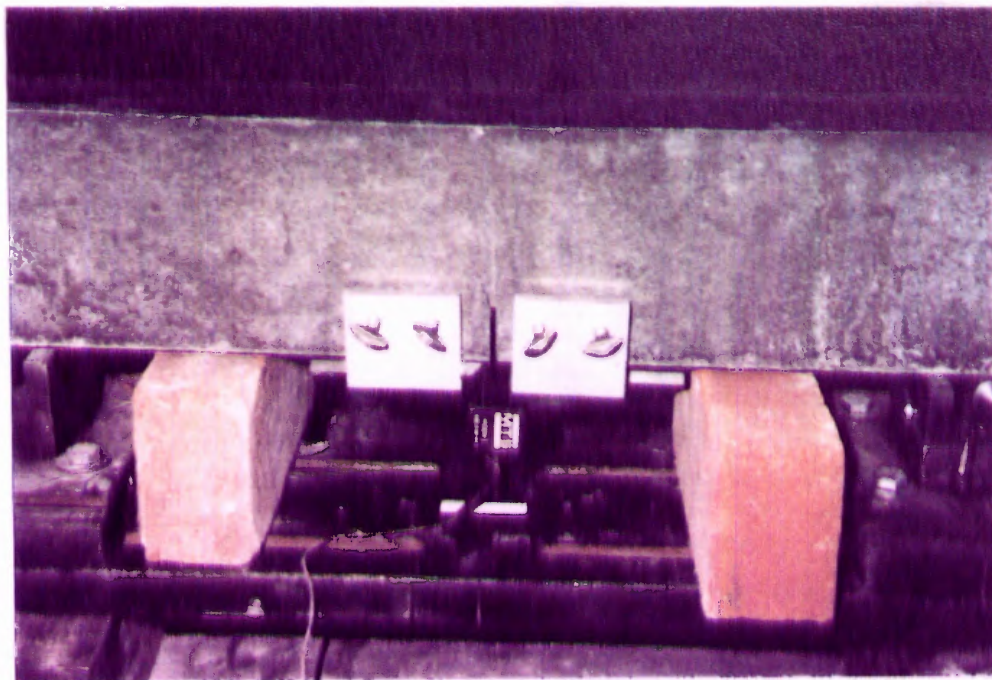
Photograph of a Cracked Beam Showing the Tendency for the Crack Path to Deviate From a Straight Line.
